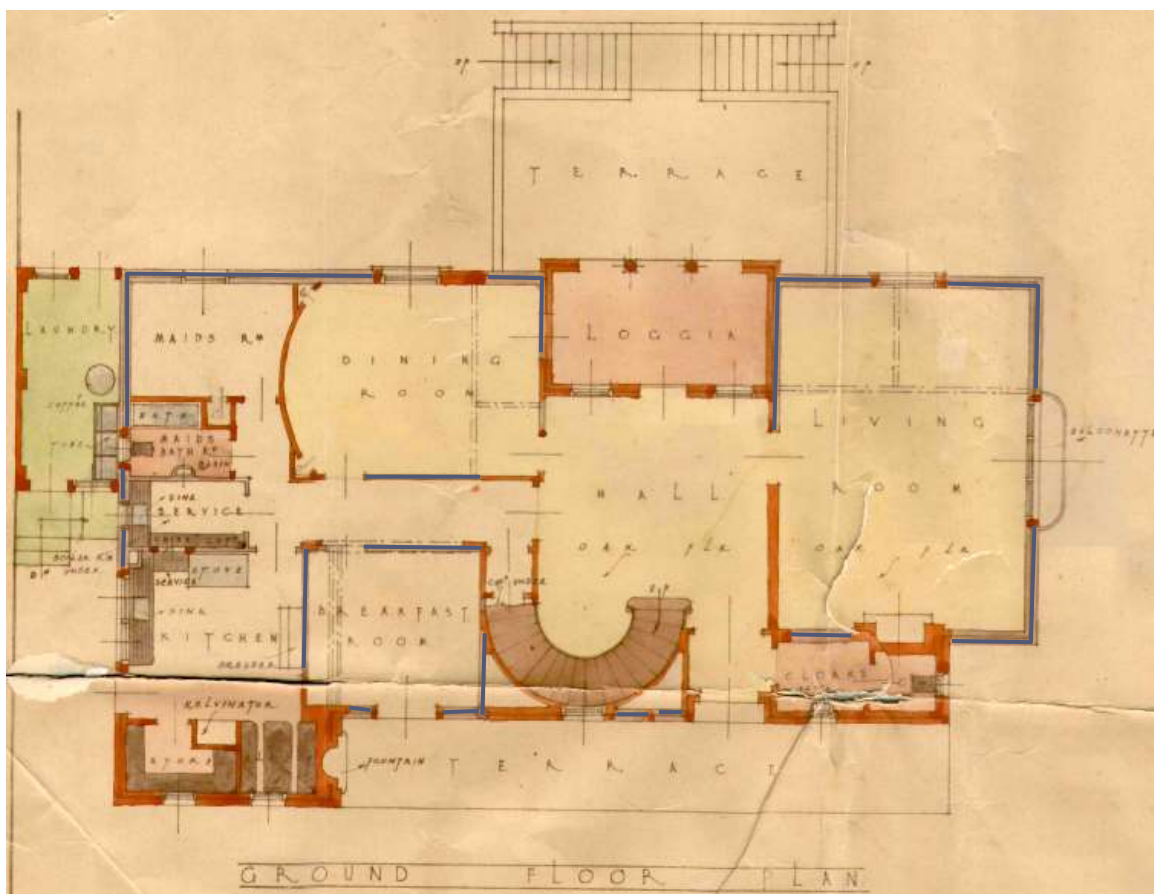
Ground floor plan of the Gilling Scheme, 1928. Note the grey walls indicating existing fabric retained from the Stanfield scheme.
